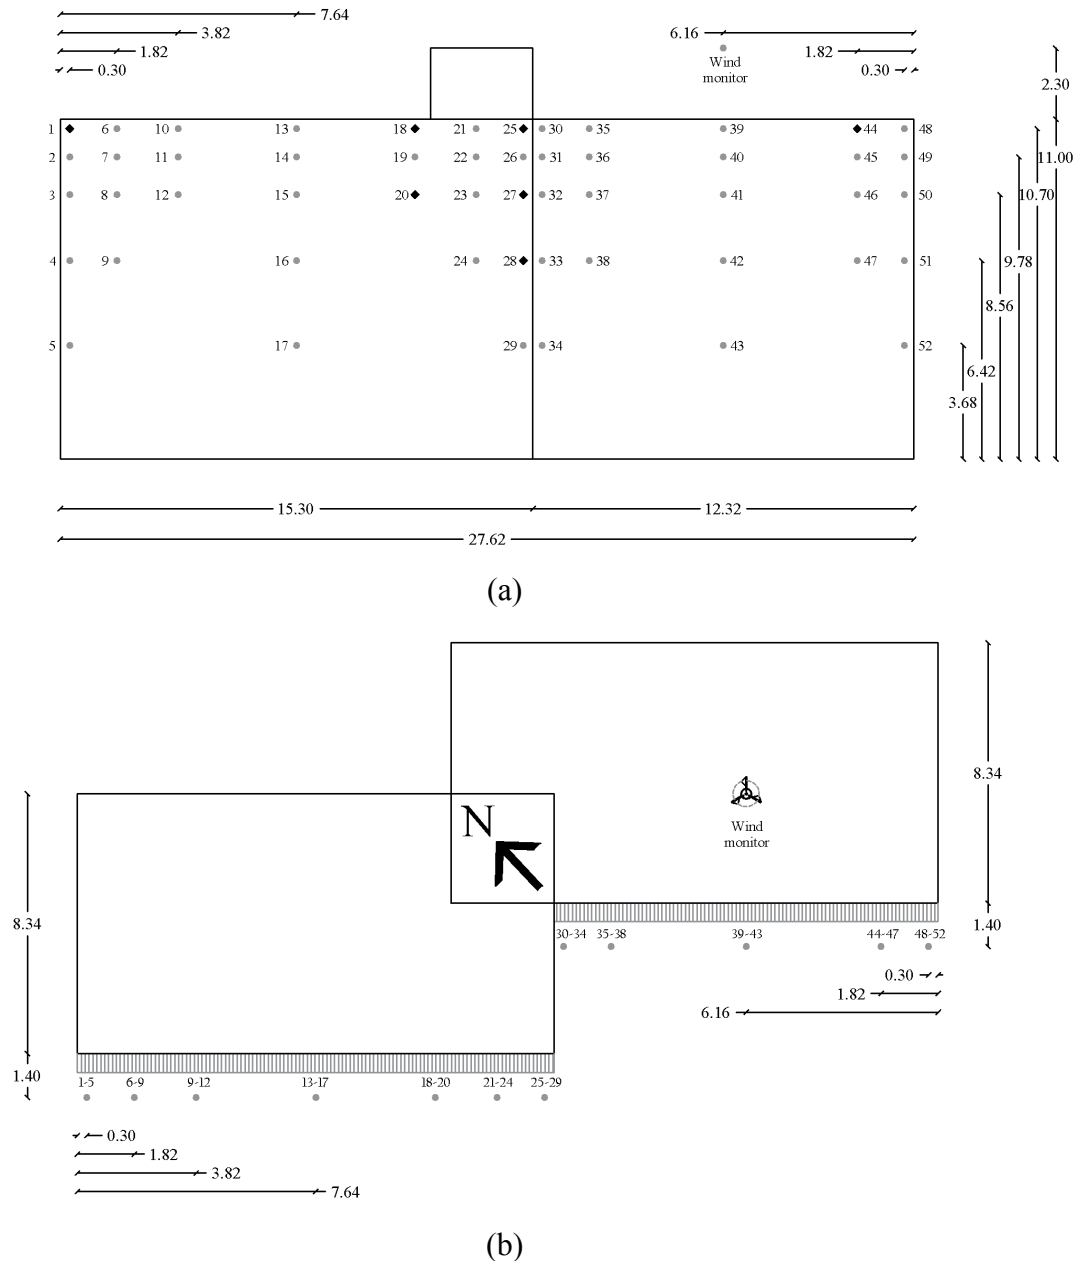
South-west elevation (a) and top view (b) of the McLeod House building model with 1.2 m overhang (scale 1:200). The measurement points near the south-west facade are shown in addition to the wind monitor location. All values are in cm.
